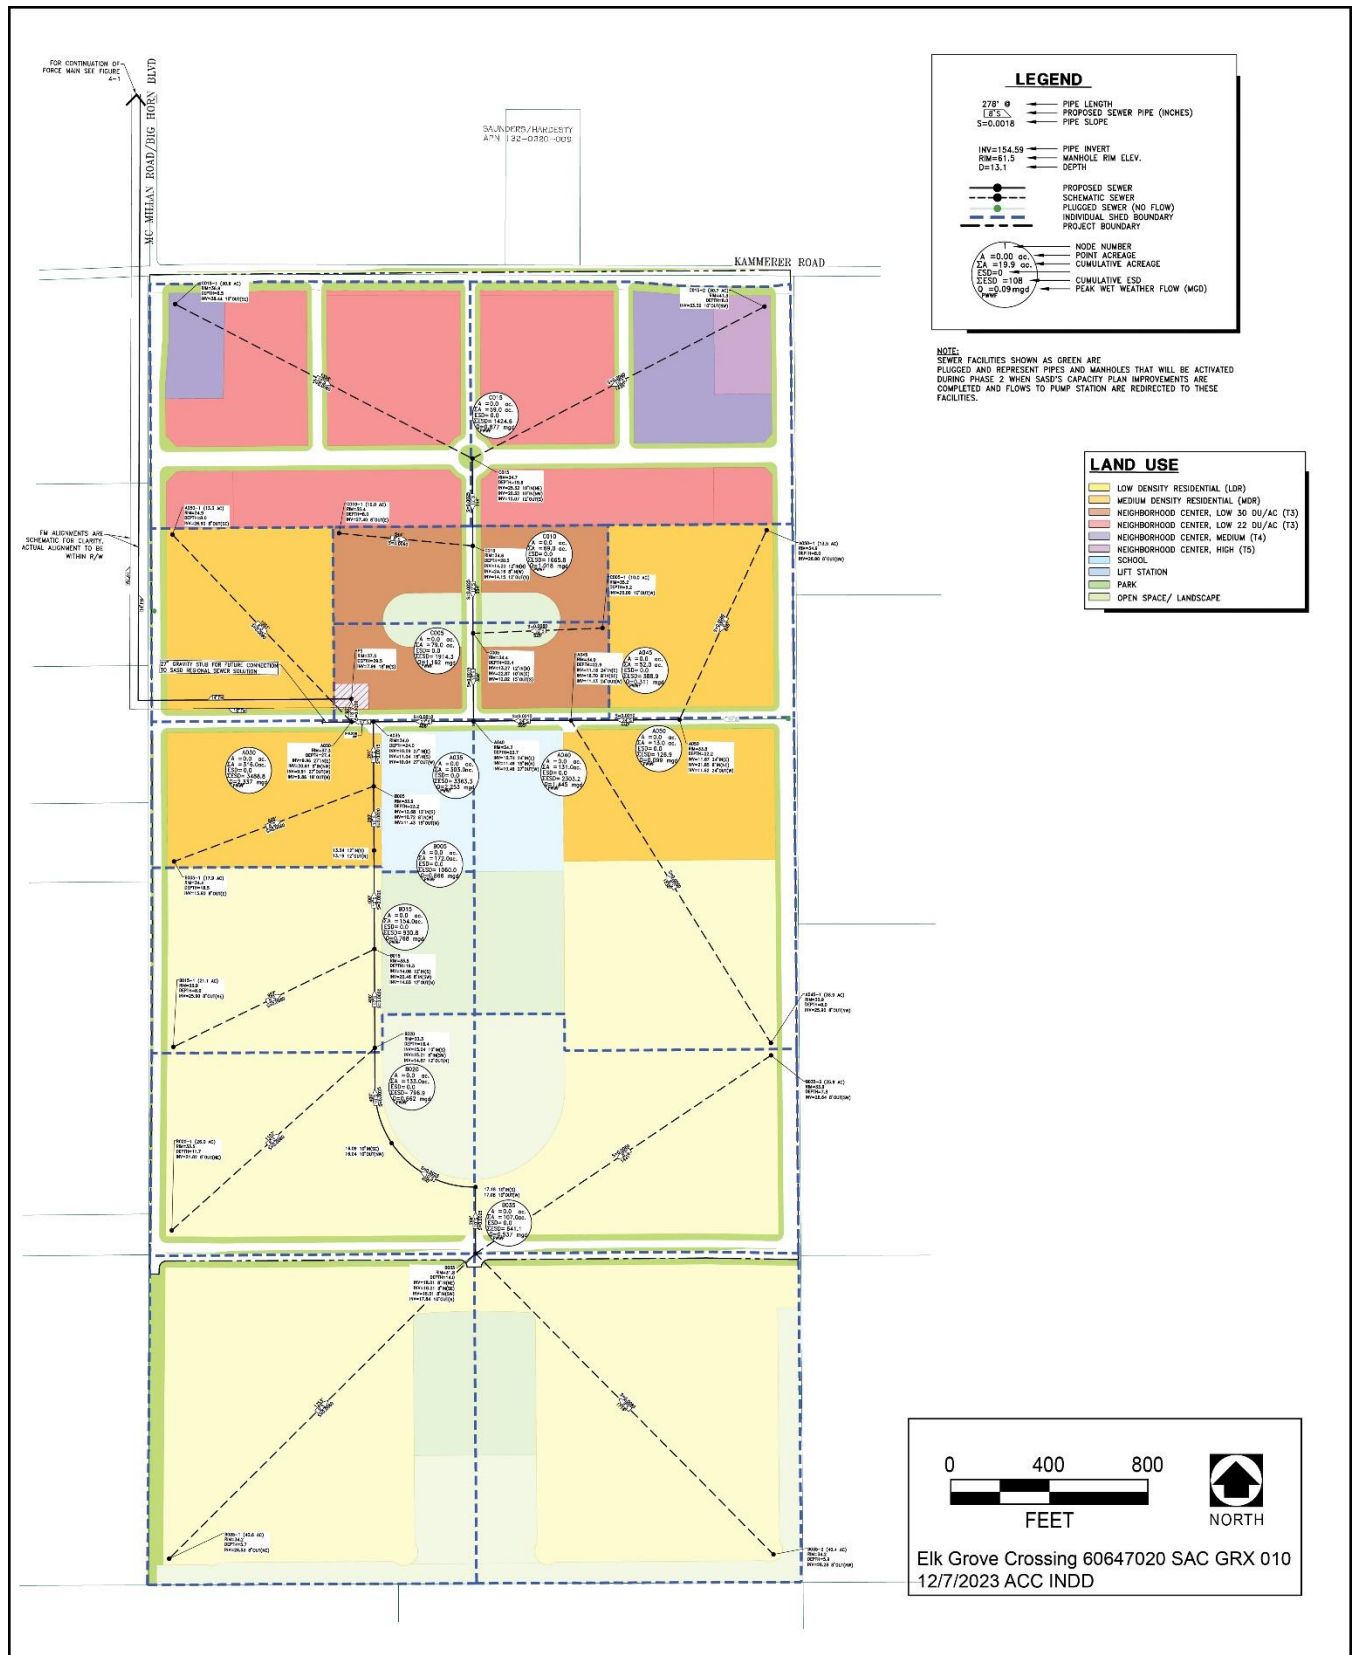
Proposed Off-Site Wastewater Conveyance System and On-Site Tie-in
